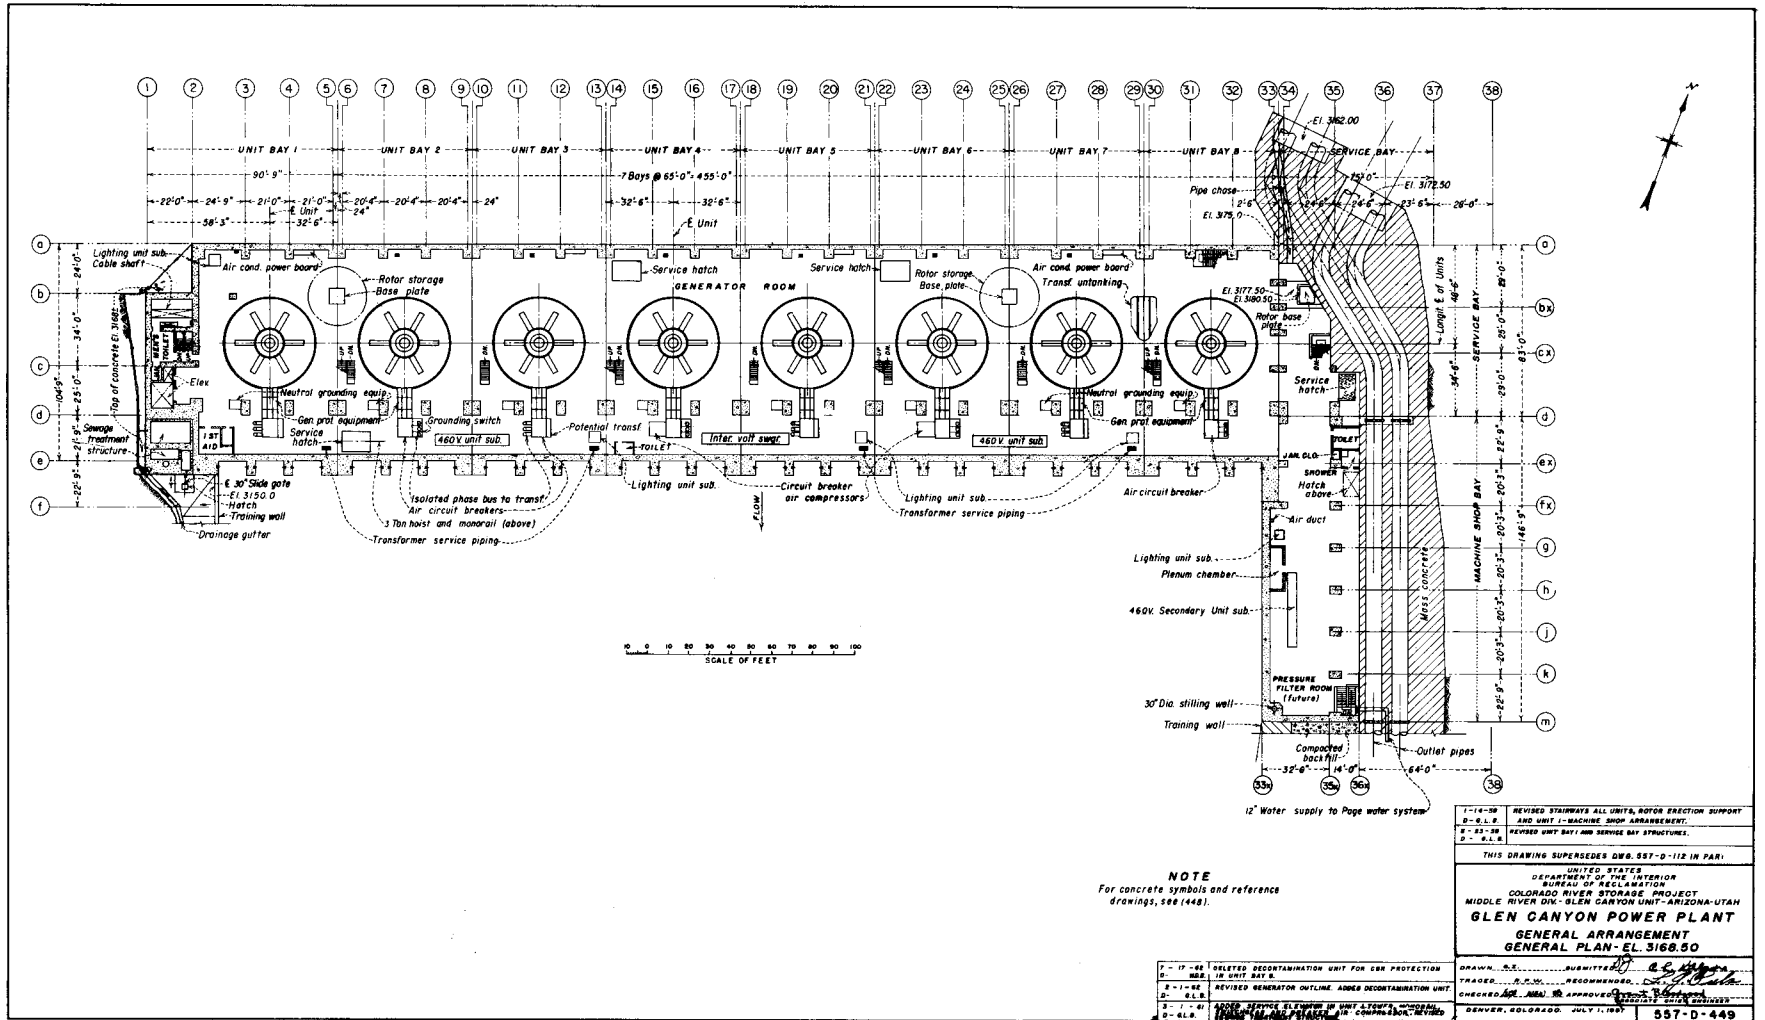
Powerplant general arrangement—Plan, elevation 3168.50.
